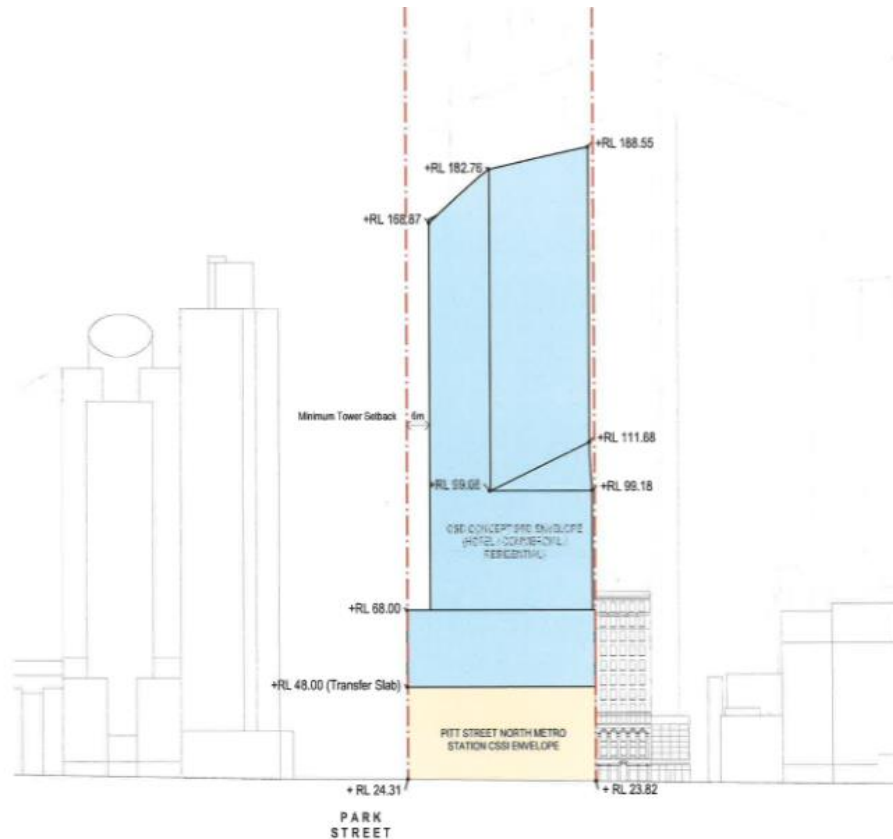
Pitt Street North Concept SSD DA – Envelope – East Elevation (Source: SSD 8875 Concept Stamped Plans)
